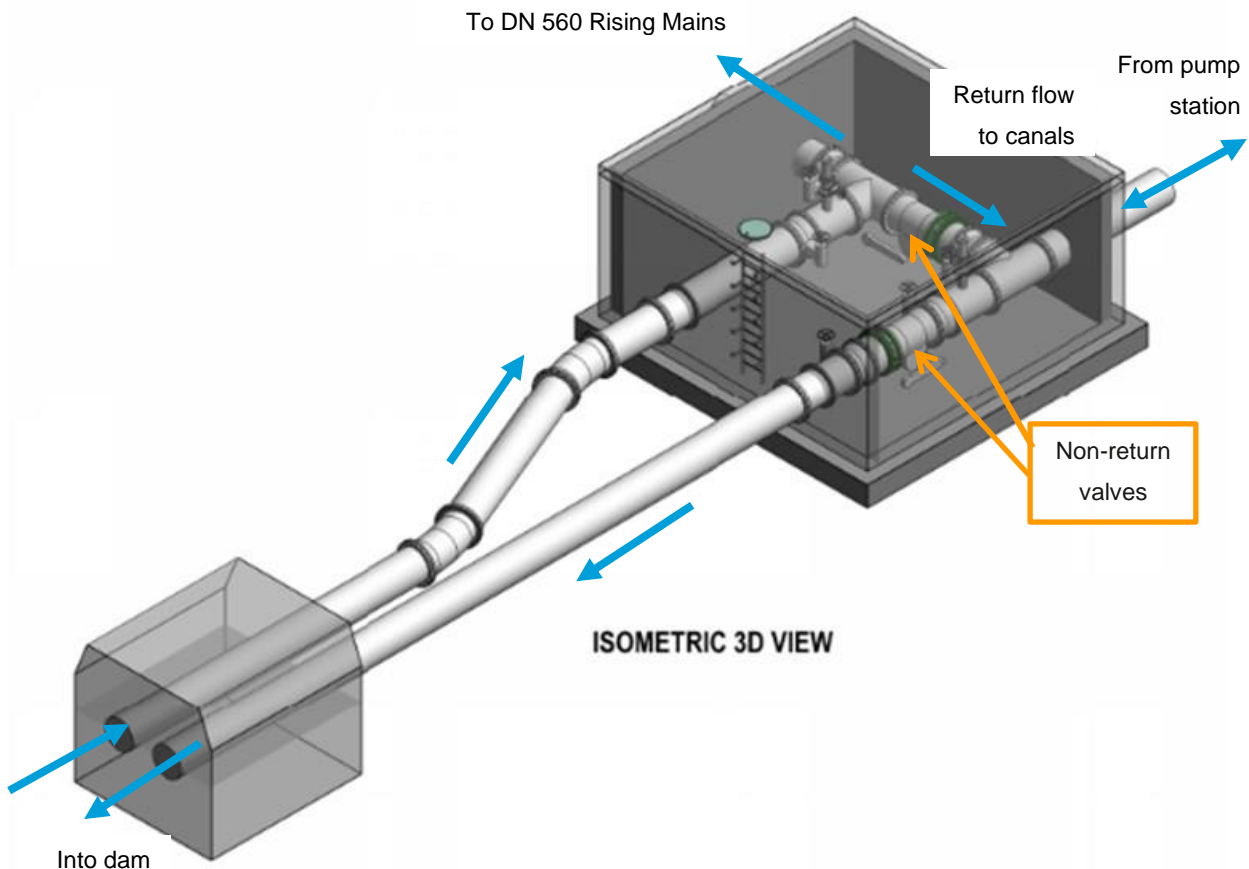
Isometric view of Ebenhaeser Balancing Dam Inlet/Outlet Chamber
